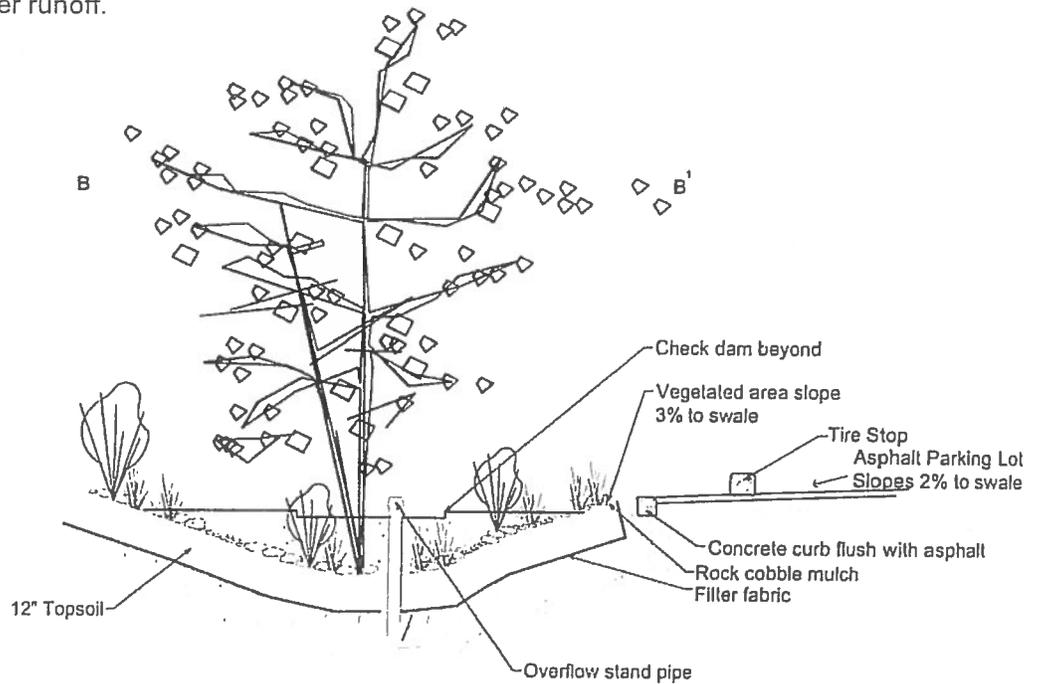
VEGETATED SWALE SECTION (EXAMPLE)
